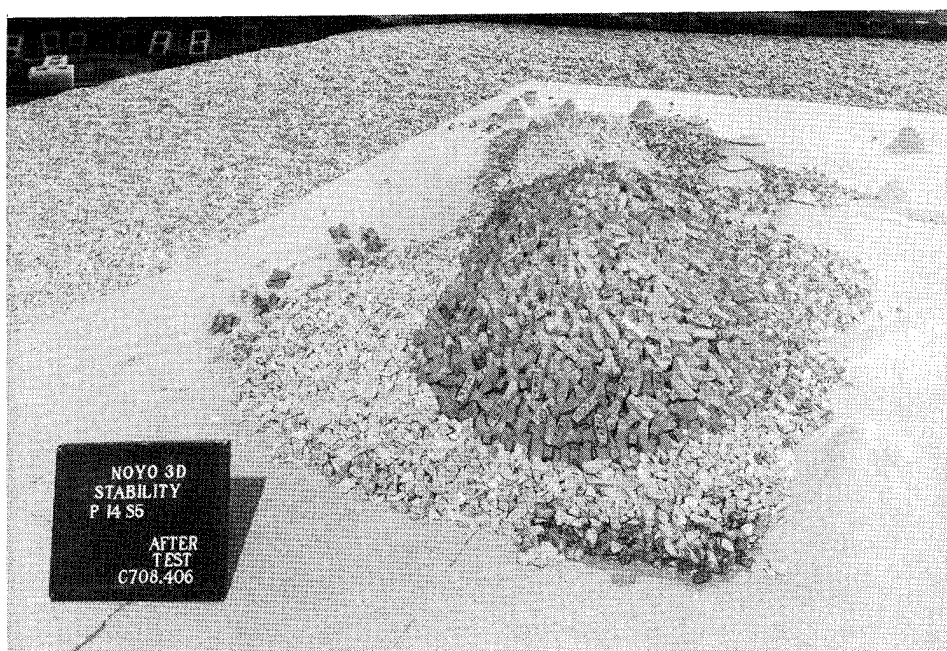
Plan 14, north roundhead after five series of Storm IB waves
